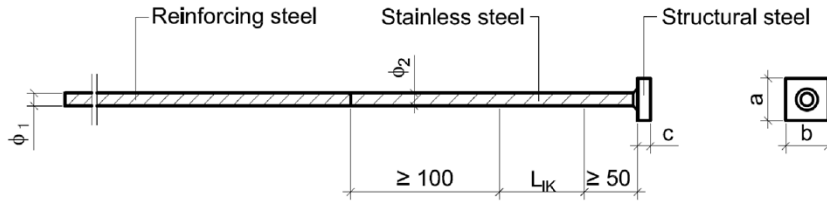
Steel compression element with welded-on compression plate and welded reinforcing steel
